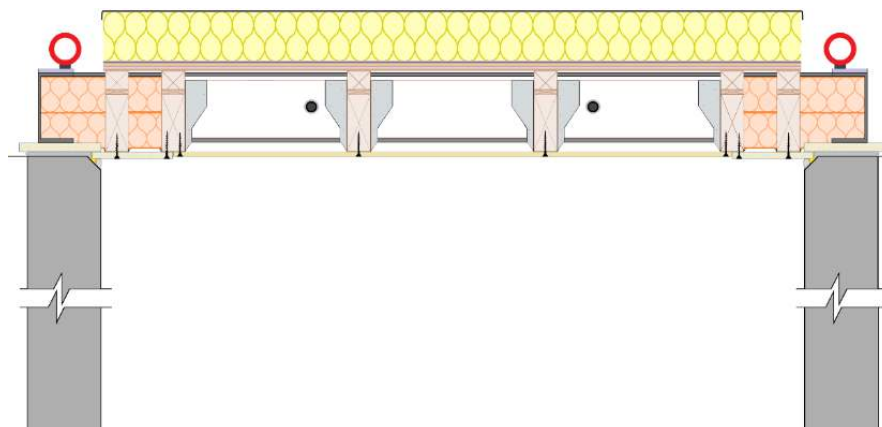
Transverse section through the furnace, showing the original concept for the frame bearing onto the side walls of the furnace
